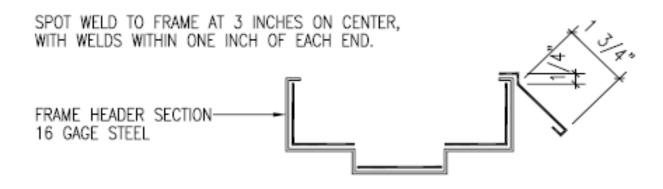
DOOR HARDWARE REINFORCEMENT DOOR CLOSER REINFORCEMENT FOR ALL STEEL DOOR FRAMES
